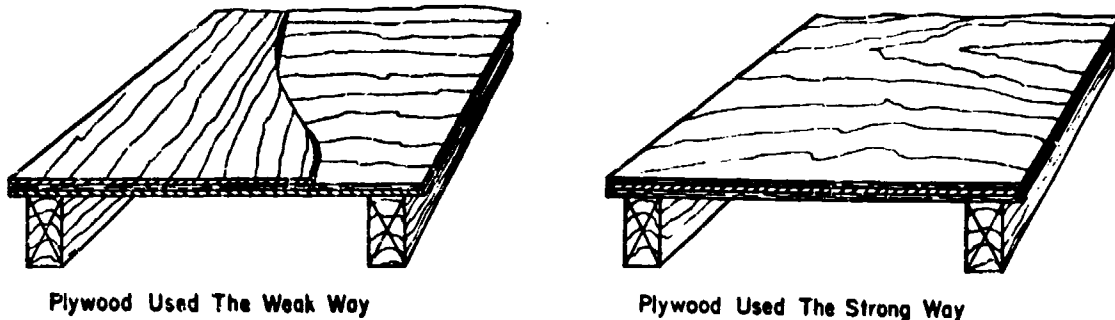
Plywoods used the correct way with face grain perpendicular to the span and the wrong way with face grain parallel to the span (Courtesy of American Concrete Institute)
